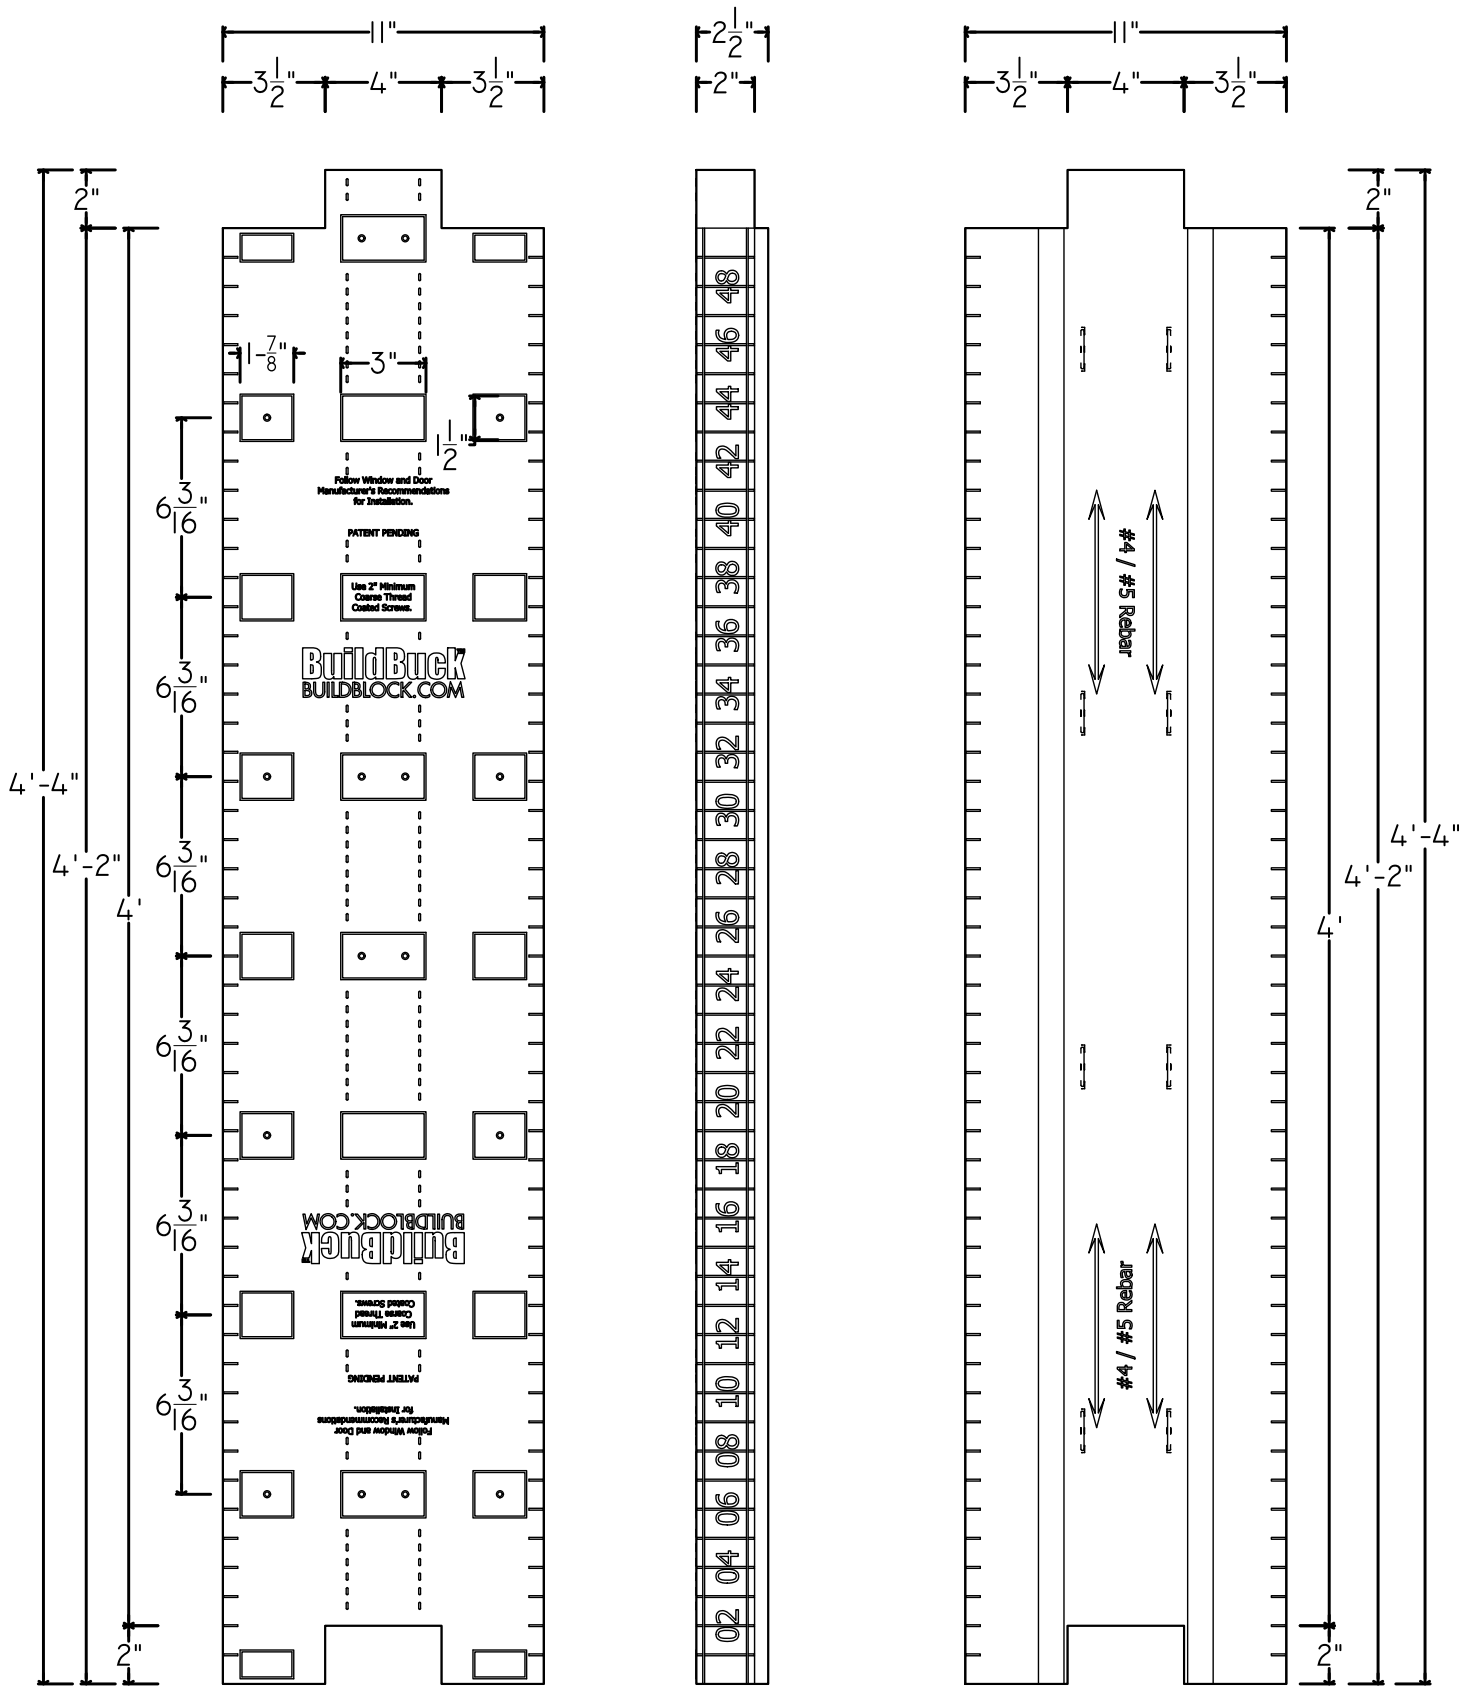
Cross bracing design for BuildBuck Door Rough Openings.
